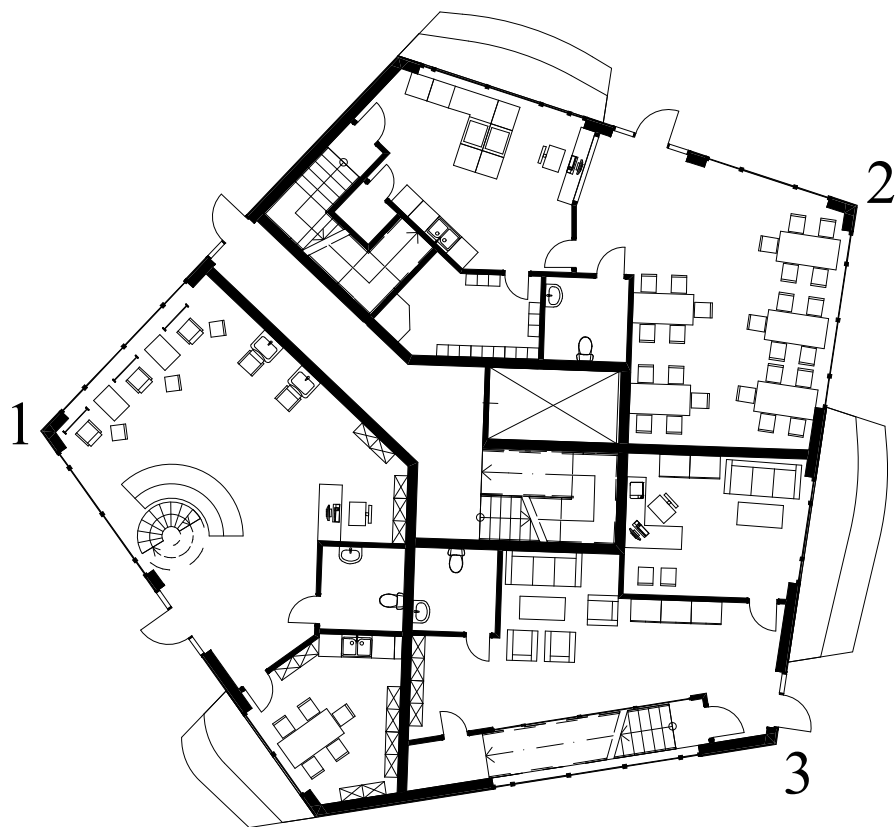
Final design proposal of the bottom floor bokal with the preferred occupations, 1:200
